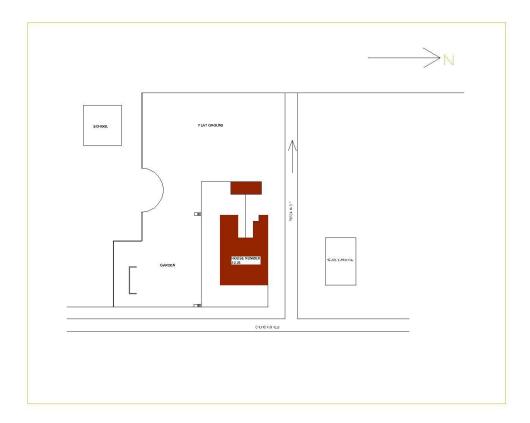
SITE PLAN TO HOUSE NUMBER 33/34
